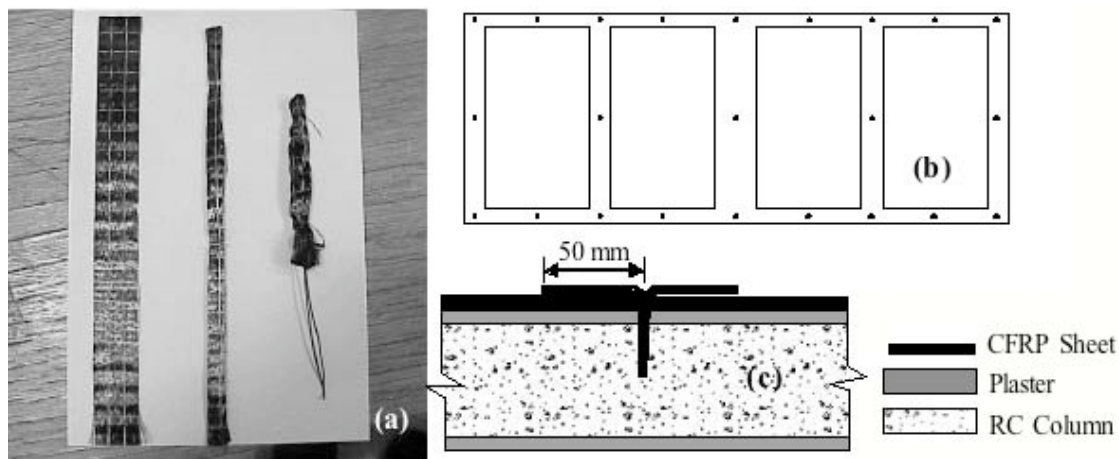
(a) Anchor dowels, (b) location and (c) configuration of anchor dowels for Specimen SP-3
